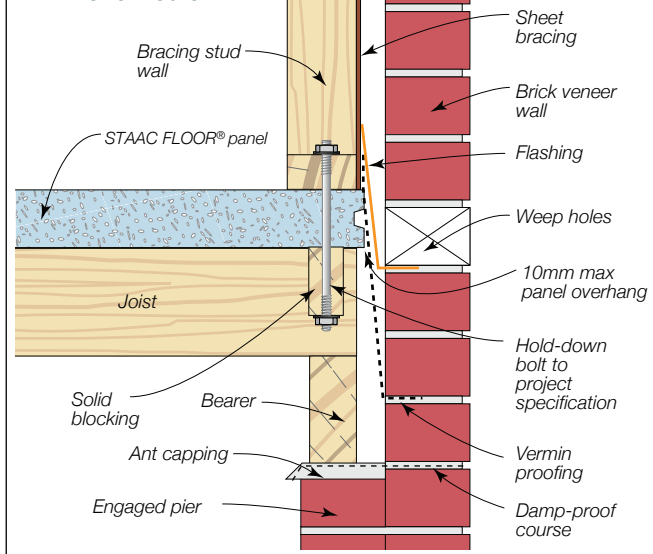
Hold-down of External Bracing Wall Parallel to Joists
